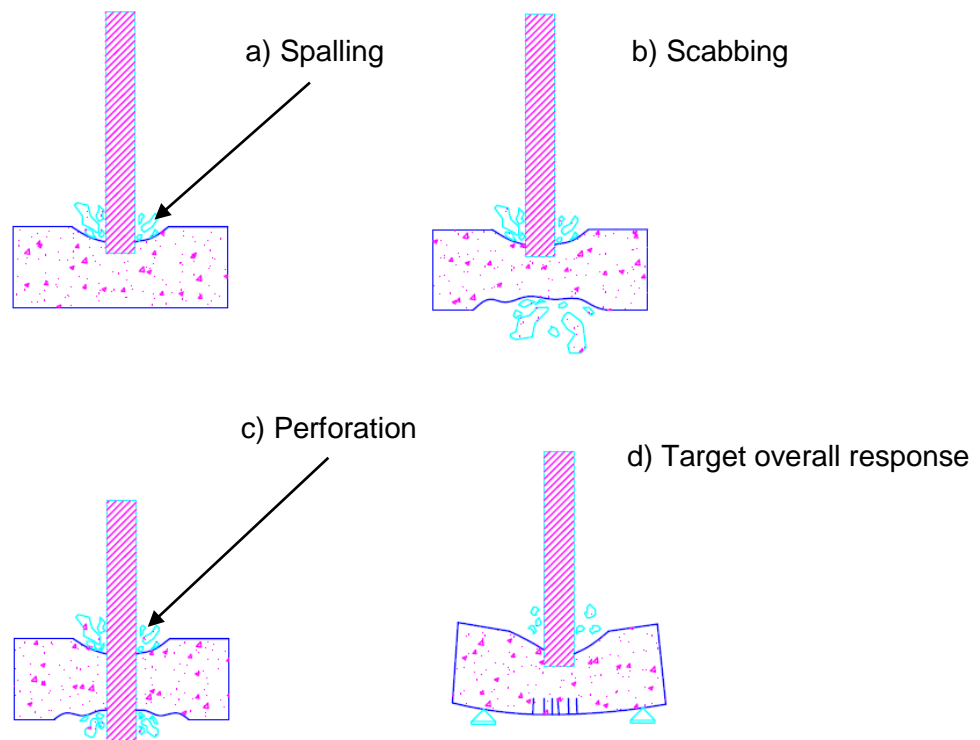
Failure mode of concrete floor subjected to impact load
